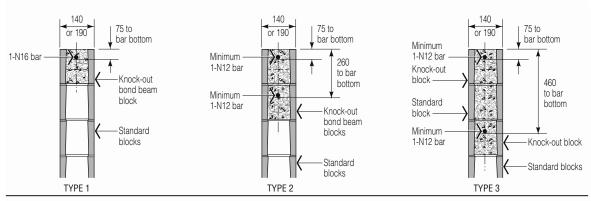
Typical Details for Bond Beams Supporting a Roof
